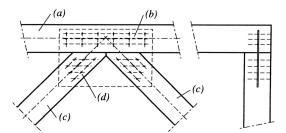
Timber diagonals connected by slotted steel plate. (a) Braced beam, (b) slotted steel plate, (c) timber diagonals, (d) predrilled nailed connection.
